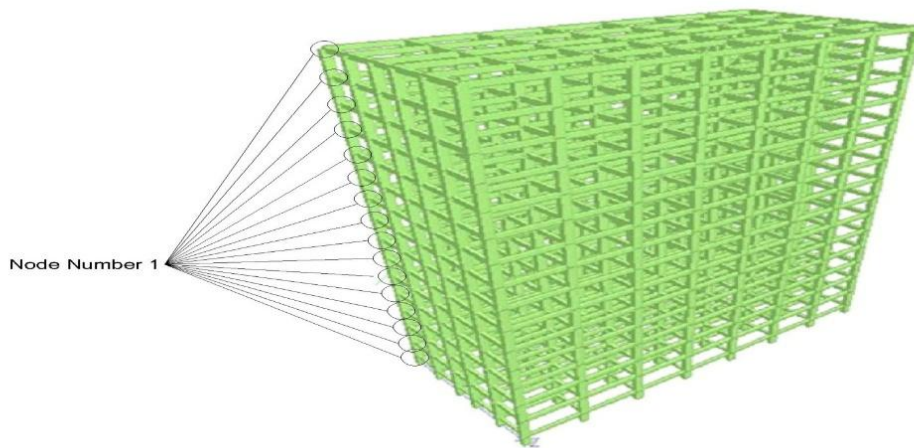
3D Rendered View of Building showing node number 1 in the building
